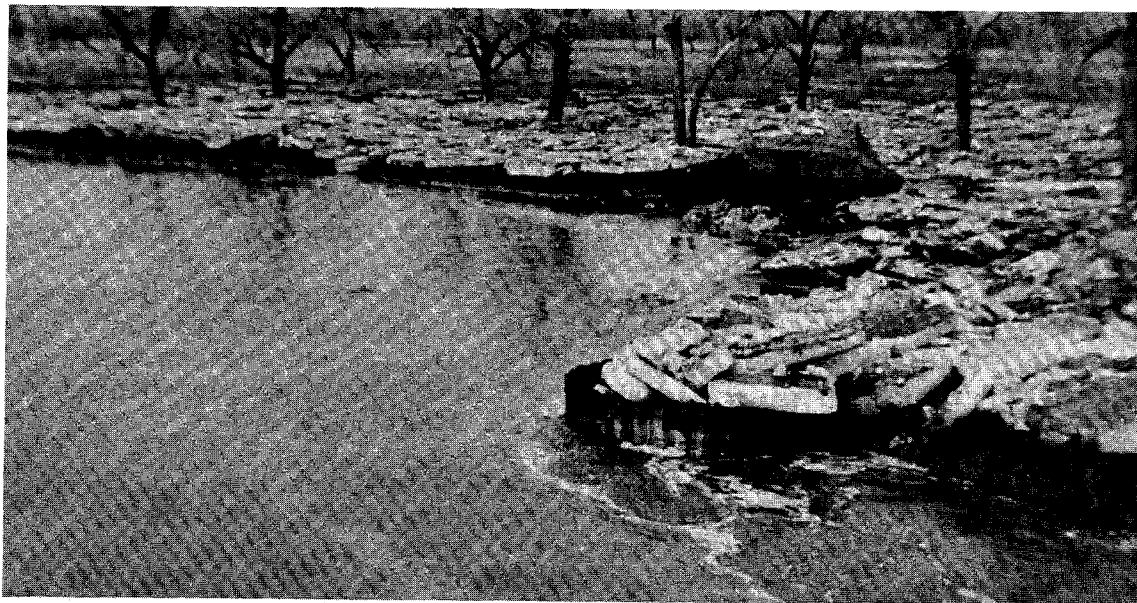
View of left bank upstream from bridge on March 14, 1972, showing flow near bankfull stage and ice blocks on sheet pile spur. (From South Dakota Dept. of Highways.)
